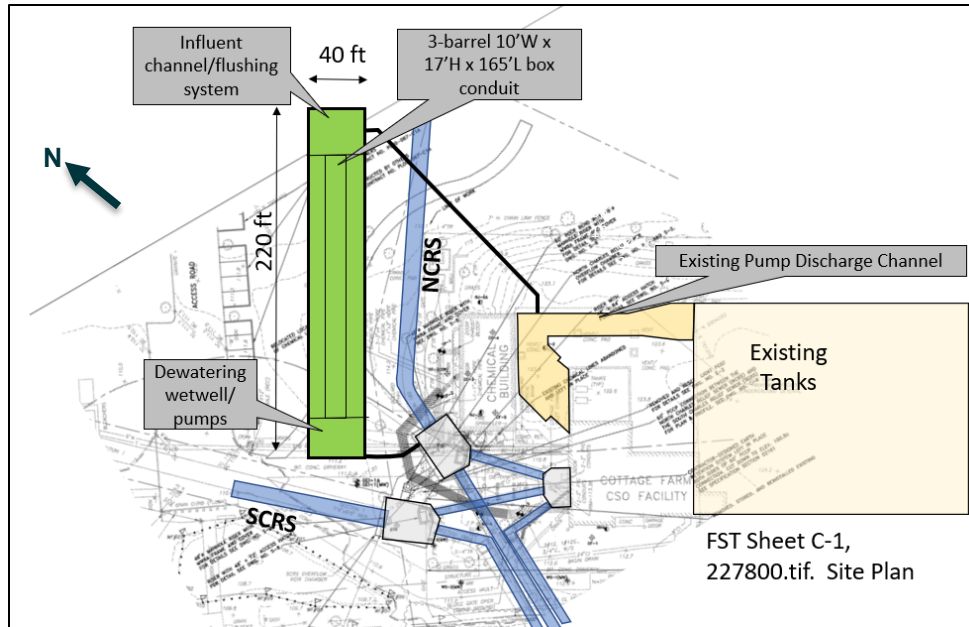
Cottage Farm – Box Conduit Storage Layout
